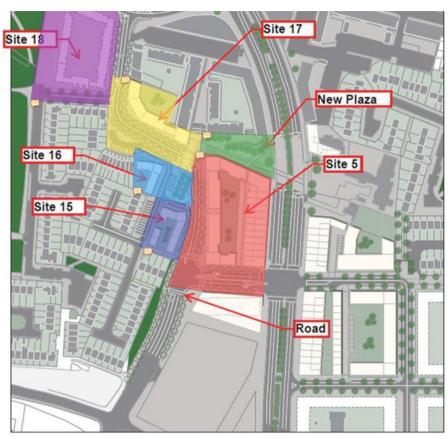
Site Plan outlining Sites 5, 15, 16, 17, 18
